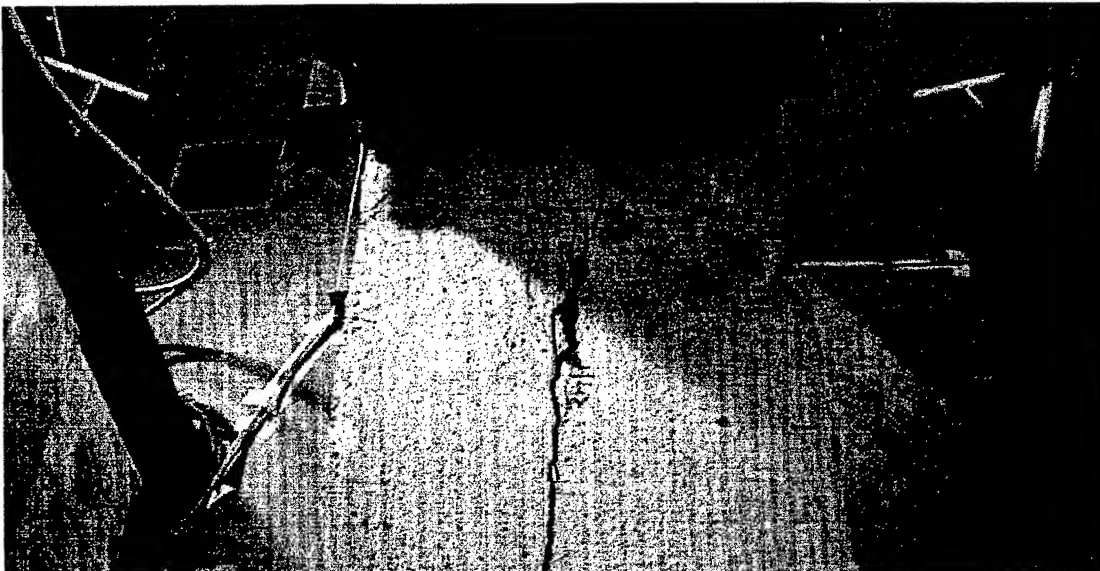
Example of Longitudinal Deck Cracking in Girder Test G1A-East
